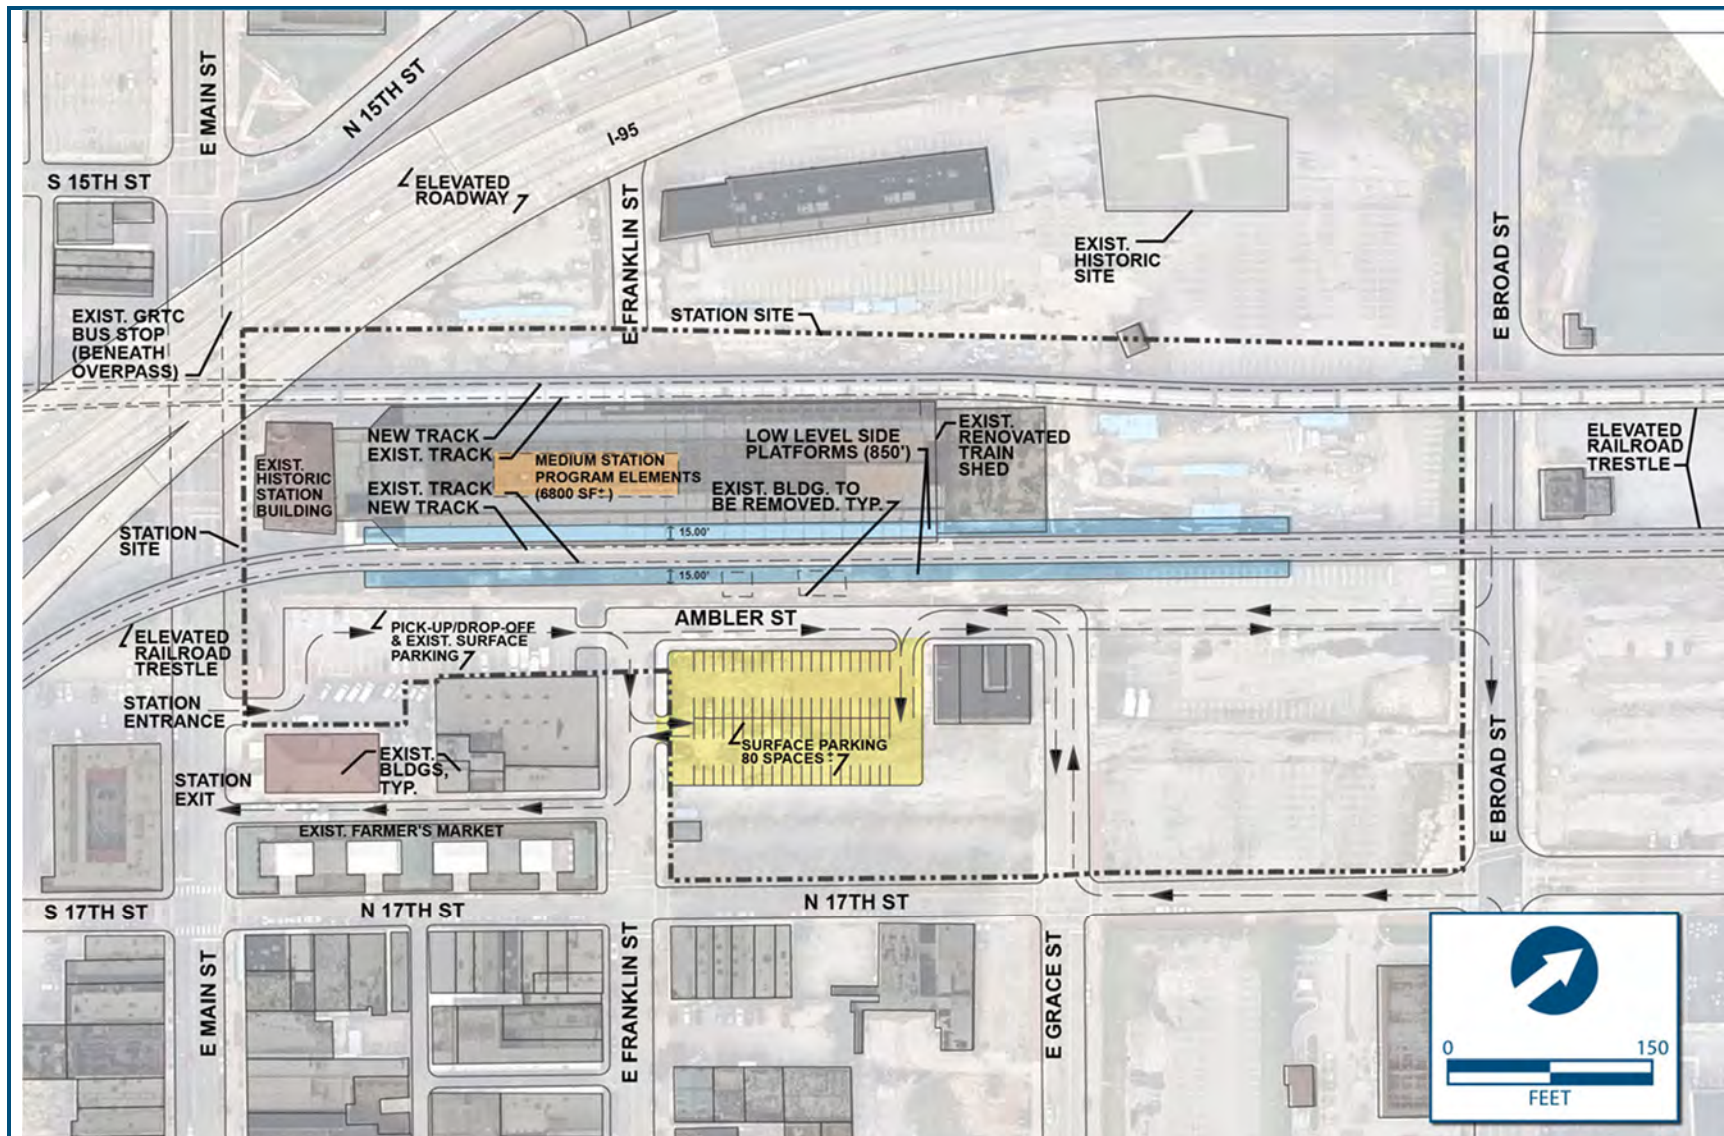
Main Street Station Improvements for Build Alternative 6E
